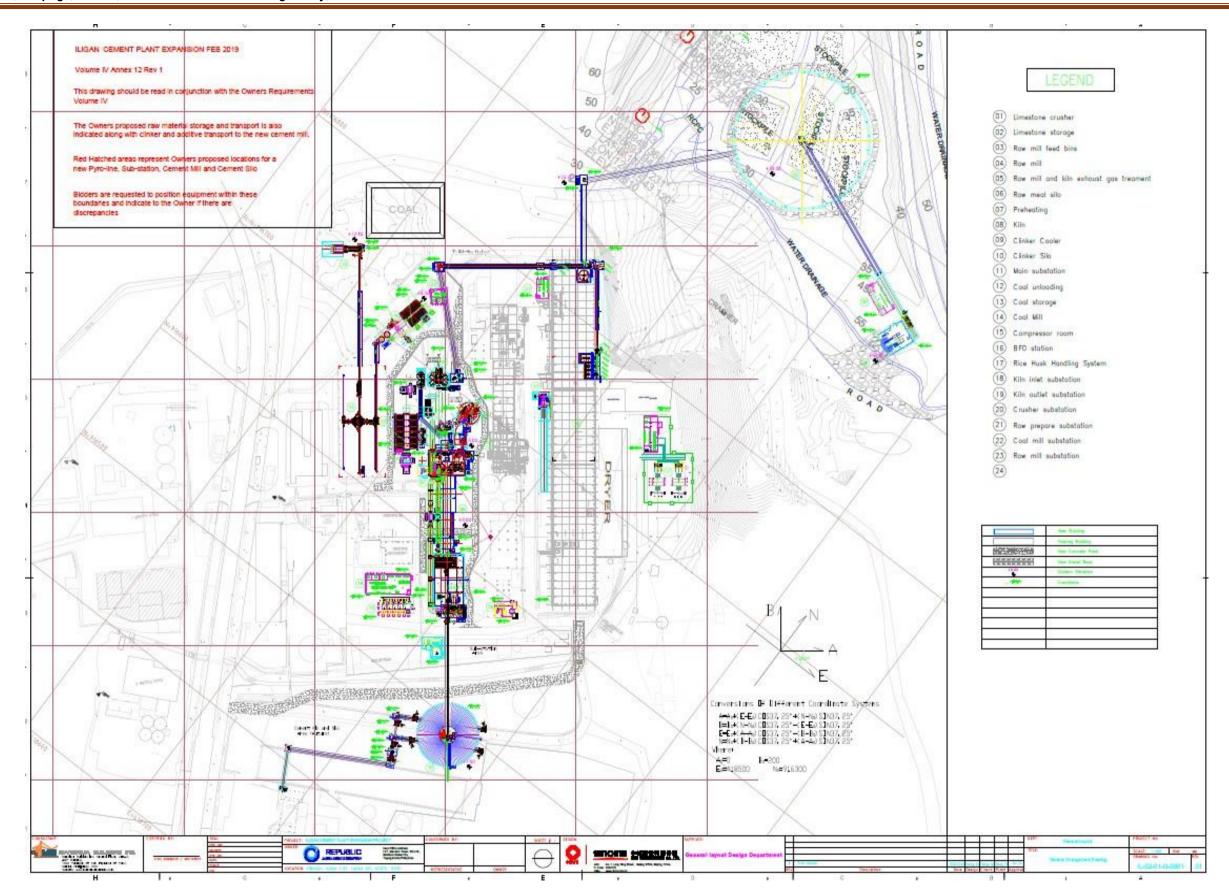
Layout of the Proposed Expansion Facilities (New Kiln Line Superimposed on the Existing Facilities)
